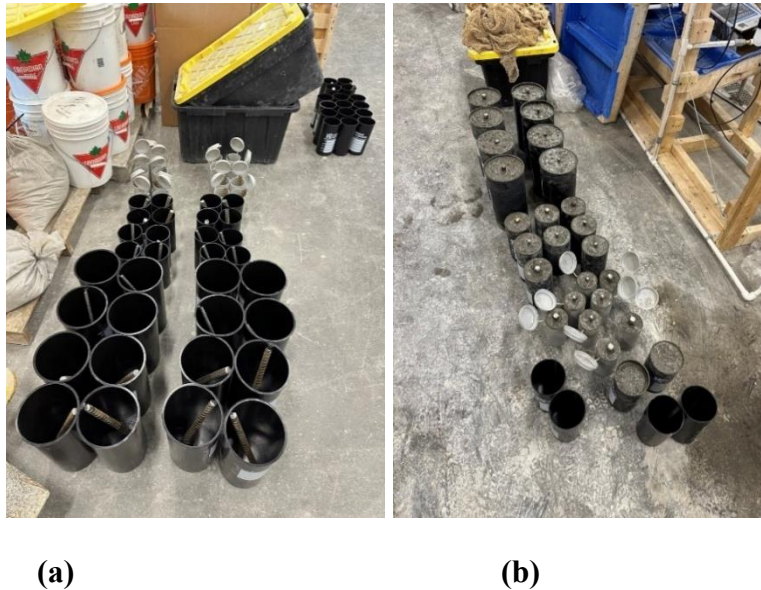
Concrete cylinders with centrally reinforcing steel bars prior to casting & (b) Concrete cylinders immediately after casting
